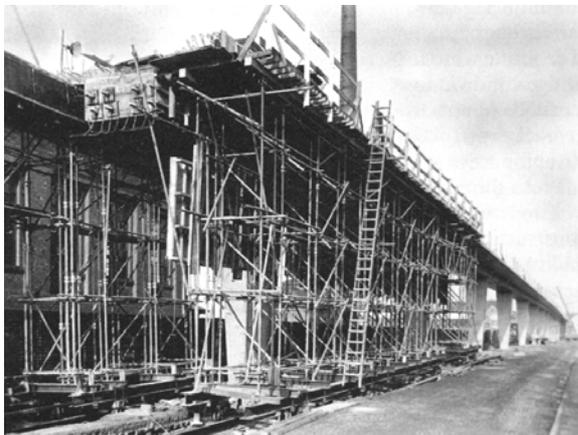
Rail mounted formwork used for a pedestrian and bicycle bridge at the Casellastrasse in Frankfurt/Main, Germany. (Wittfoht)
